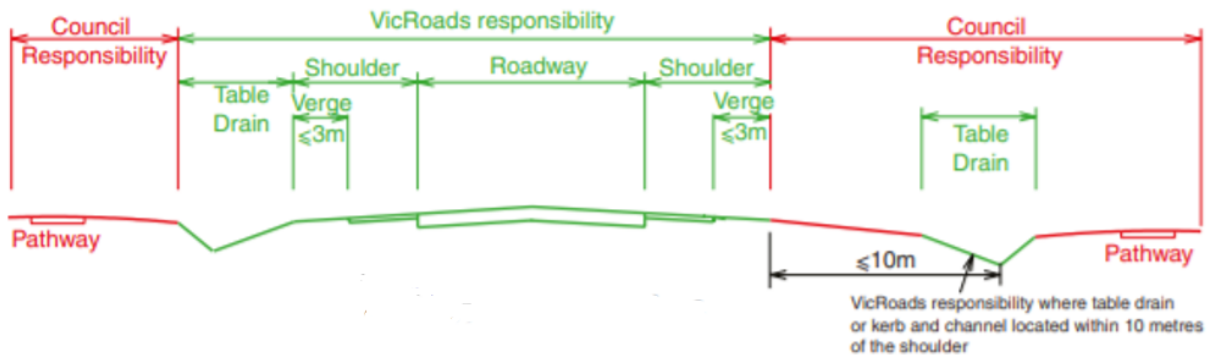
Demarcation Arrangements for Typical Rural Arterial Roads
